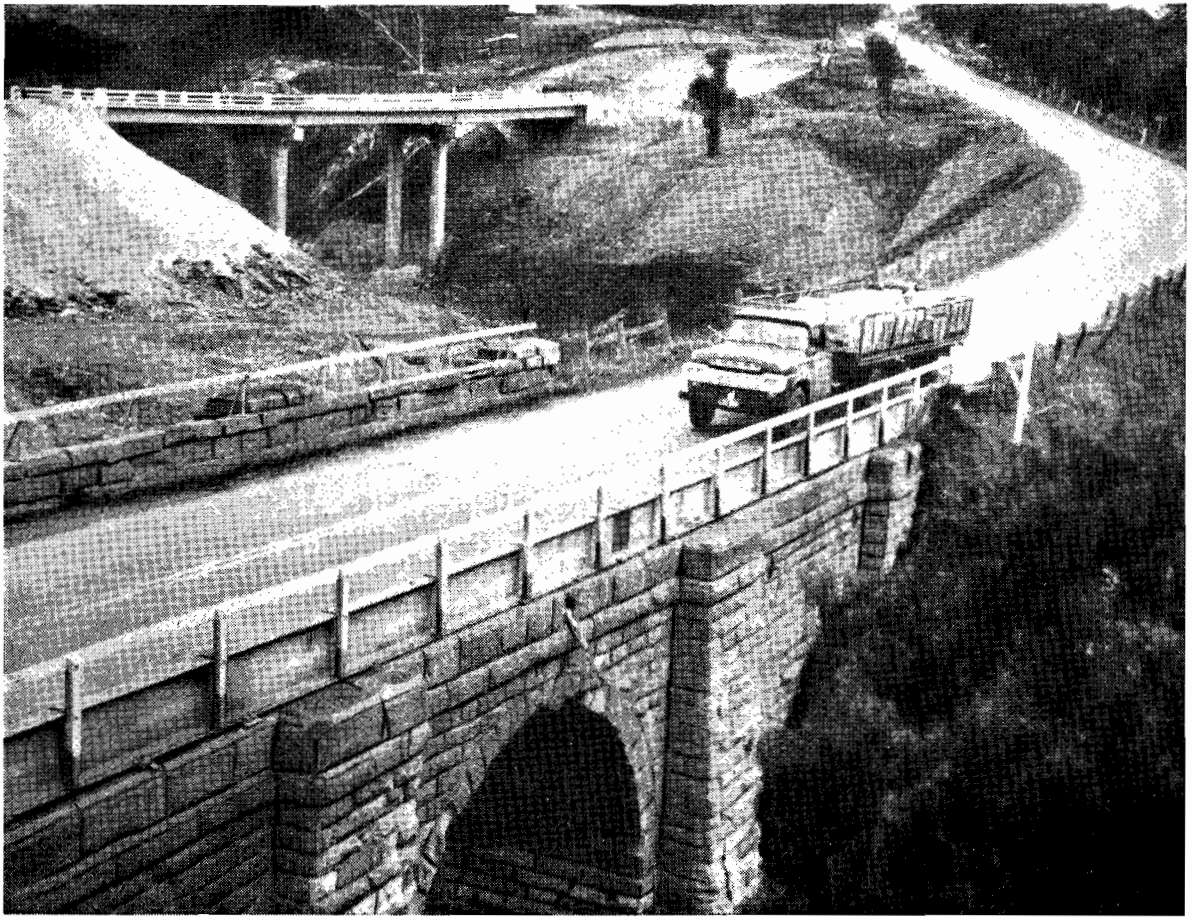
Shires of Melton and Bacchus Marsh. Western Highway, Section 1. Bridge on new alignment over Djerriwarrh Creek with old narrow bridge in foreground.
